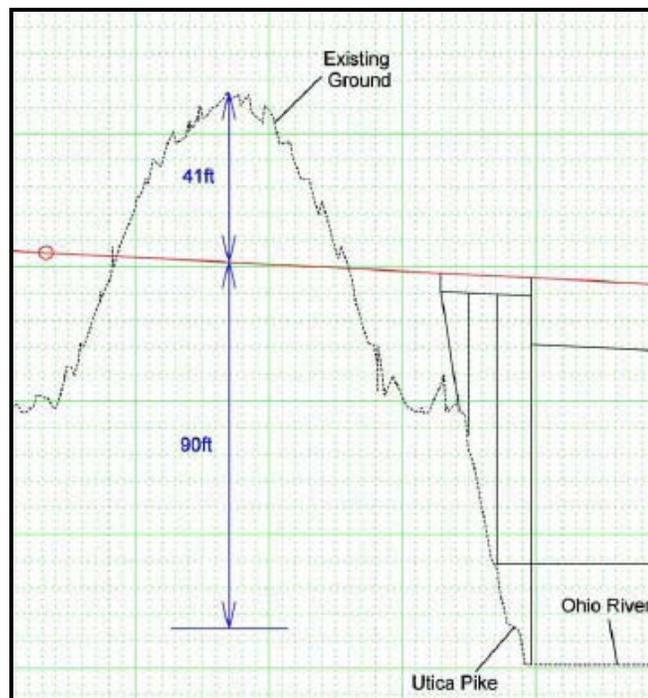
ELEVATION VIEW OF ALTERNATIVE A-15
